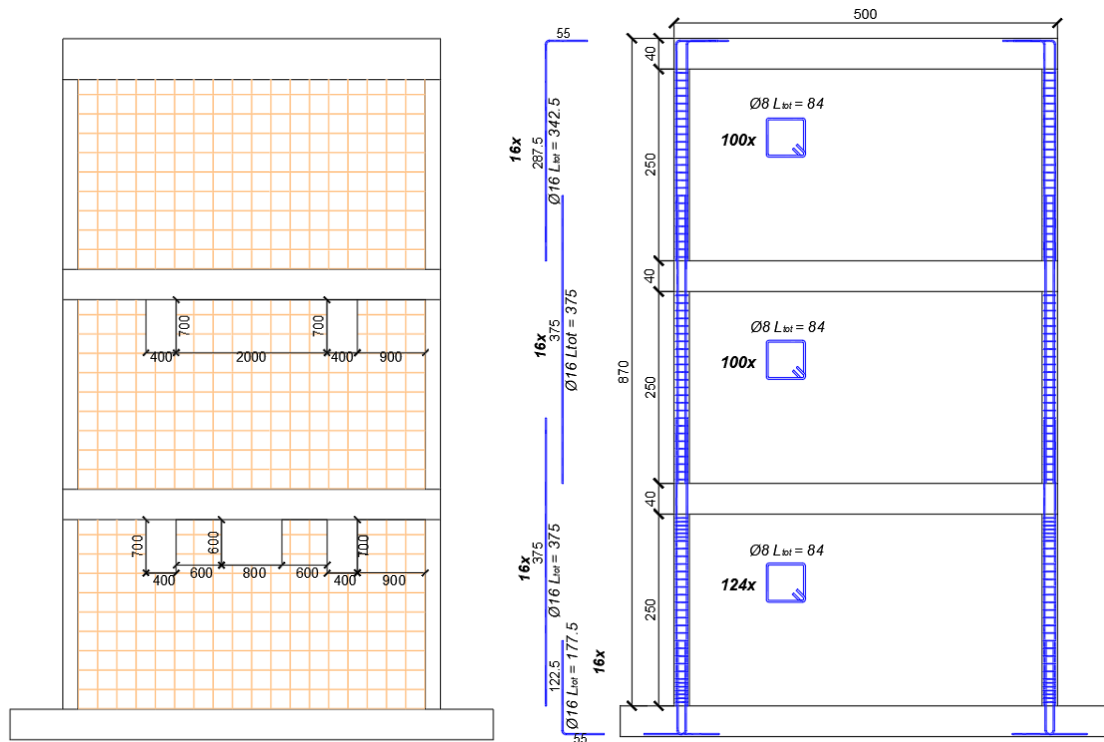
a) Elevation view of the buildings; b) Reinforcement details of the columns.
